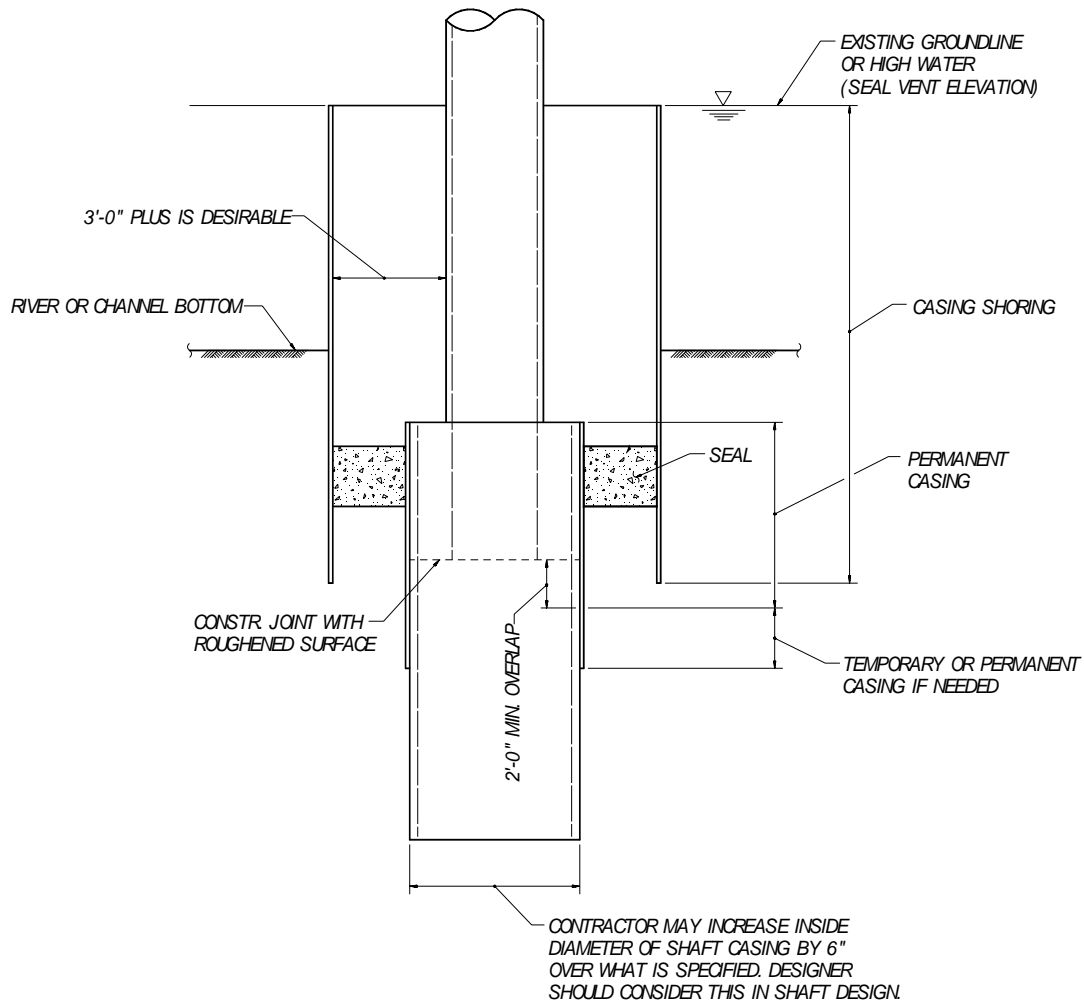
Construction of a Type II Connection Detail over Water (after ADSC West Coast Chapter)
